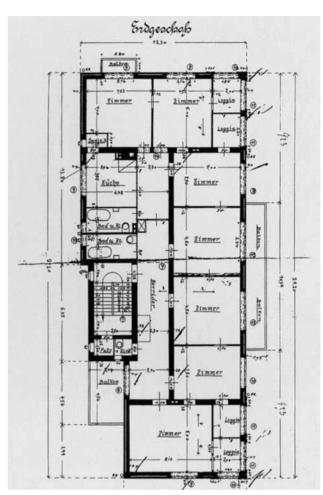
Boardinghouse, Berlin-Westend, Kastanienallee 32, August Endell, 1908, plan of first floor
